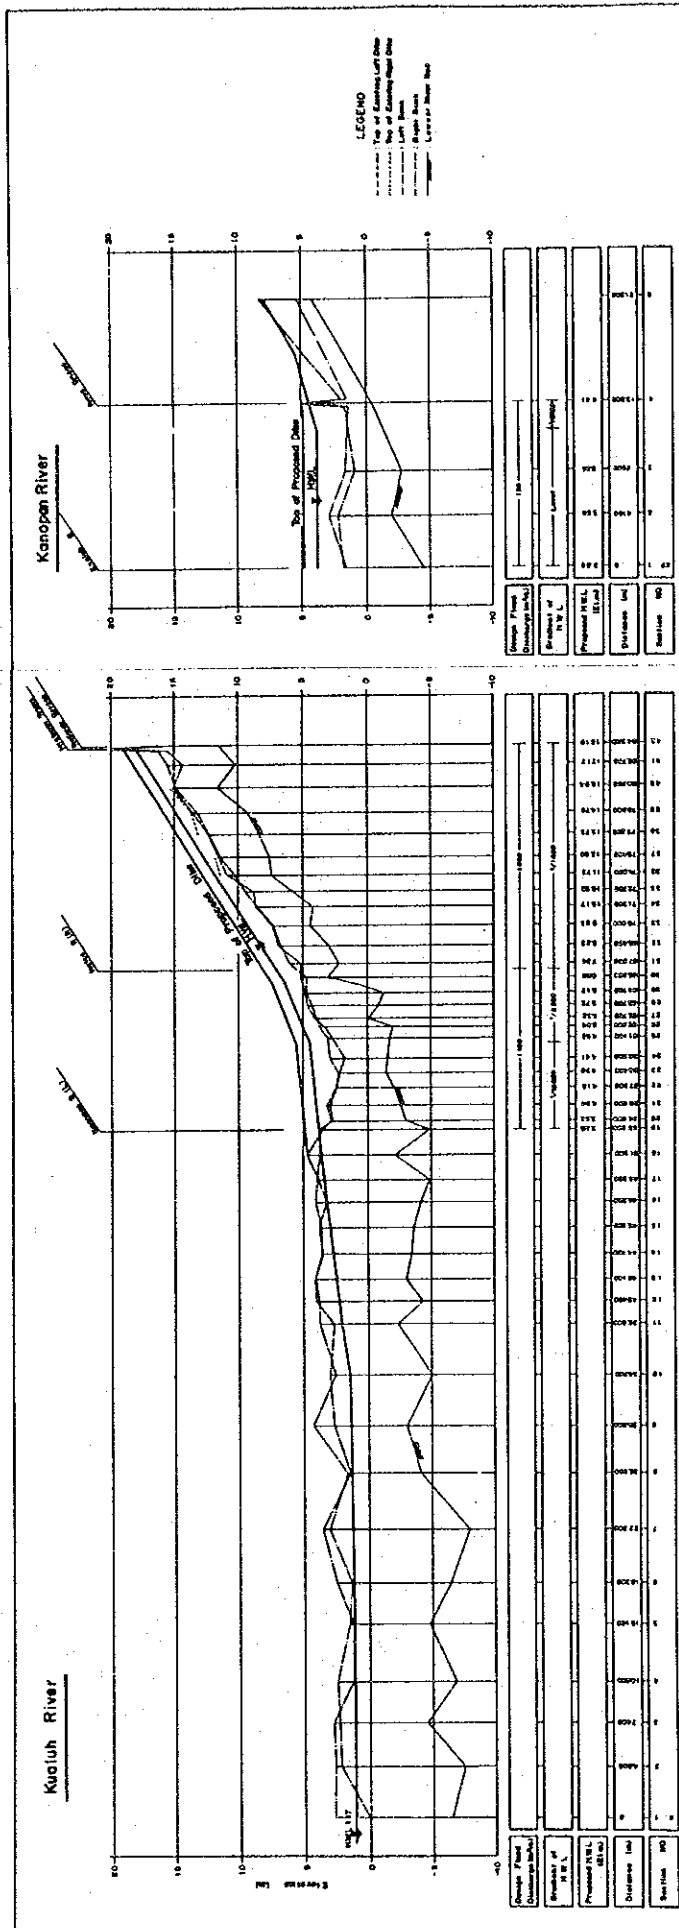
Proposed Long-Term Plan of Kualuh River (3/3)
